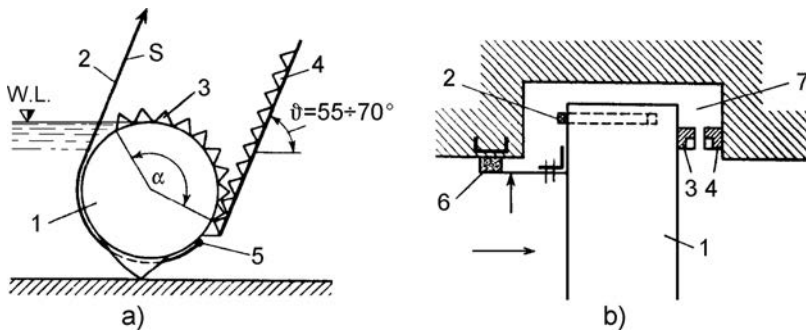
Scheme for the supporting parts of the roller gate (after Grishin et al., 1979). (a) Cross-section; (b) layout. (1) Roller gate; (2) elastic rope; (3) toothed wheel rim; (4) toothed rail track; (5) fixing of the rope to the gate; (6) seal; (7) gate slot.
